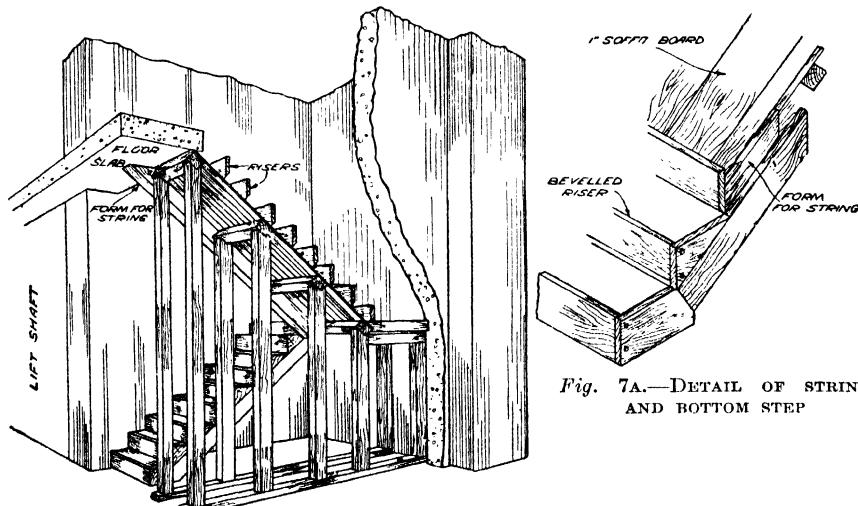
FORMWORK FOR CONCRETE STAIR AT D IN FIG. 1
